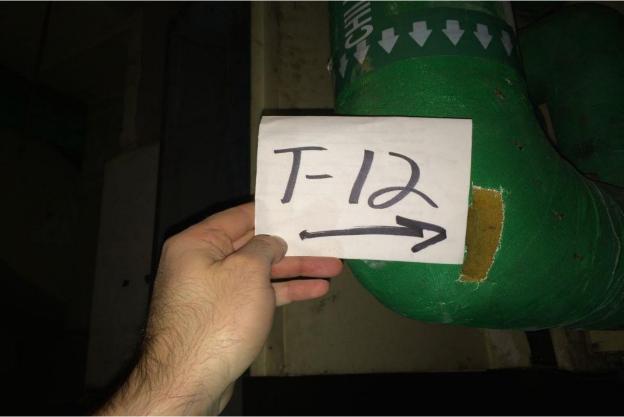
Laboratory analyses did not detect asbestos minerals within plumbing insulation sample TS-12 collected from the Theatre Building basement boiler room.
